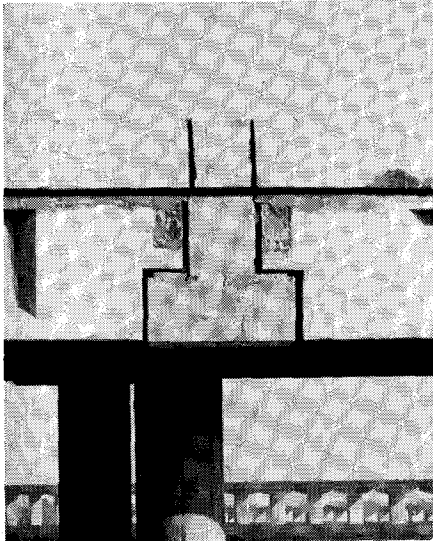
Nuns' Island Bridge Girder to Pier Cap Connection
